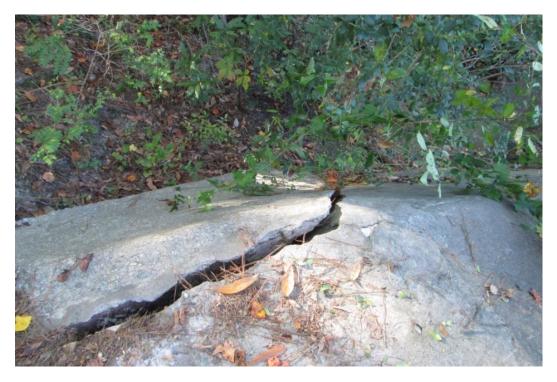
Vertical crack/slabbing in left abutment of lower stone dam
